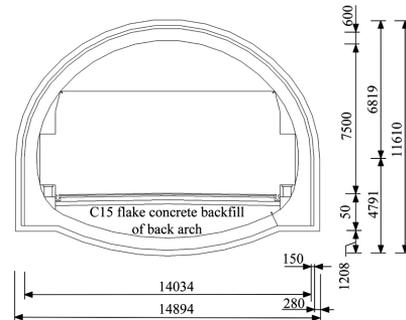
Xishan Tunnel building boundary and tunnel profile (mm)
